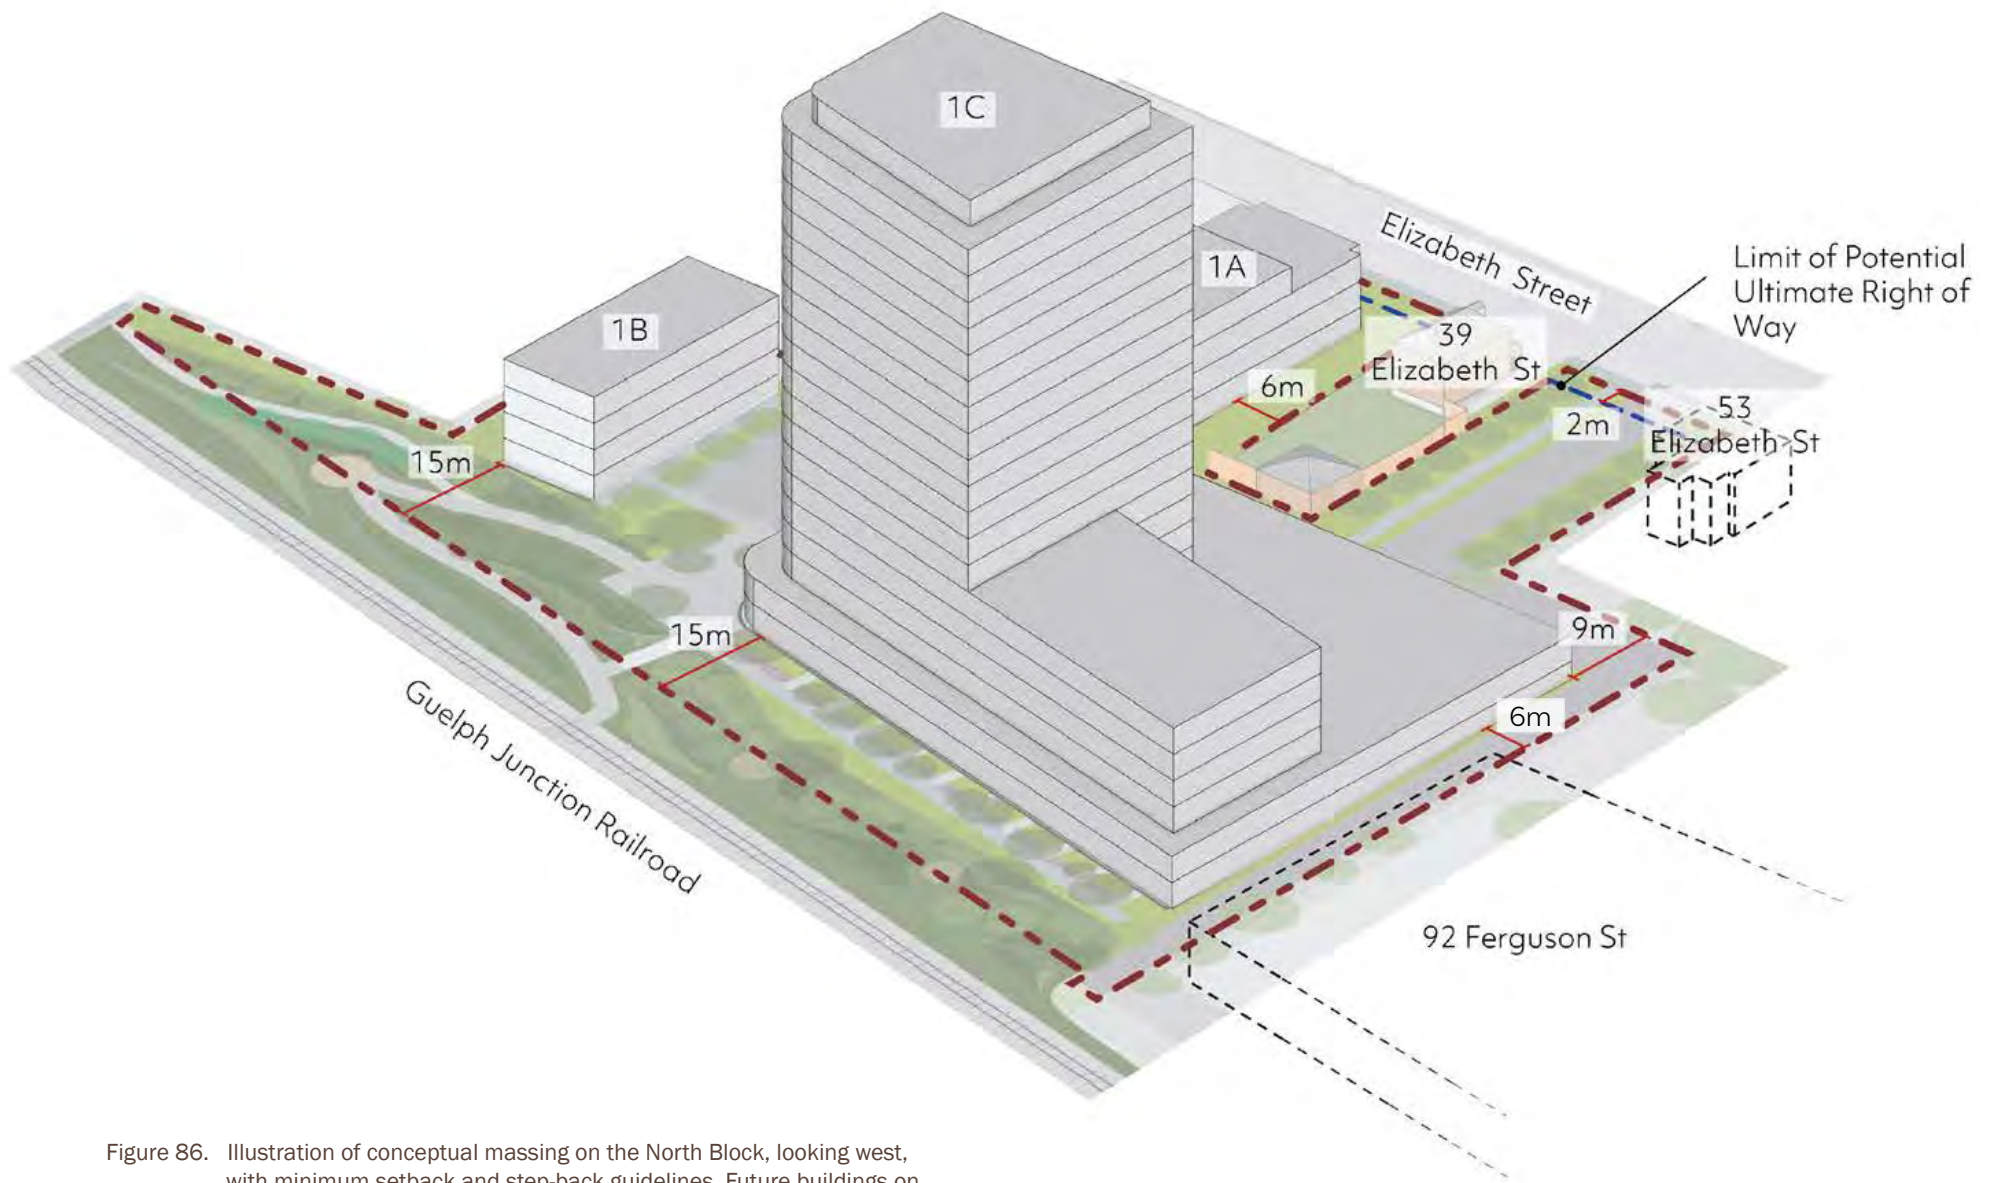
Illustration of conceptual massing on the North Block, looking west, with minimum setback and step-back guidelines. Future buildings on the north block should frame and help to enhance the Eco-Park.
